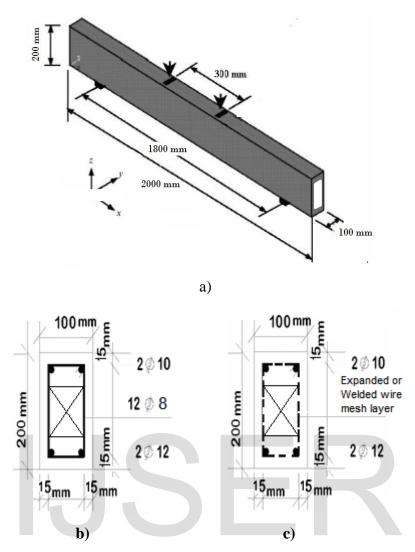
a) Beams geometric shape and reinforcement details, b) control specimen; c) sample of beam with expanded or welded layer mesh.
